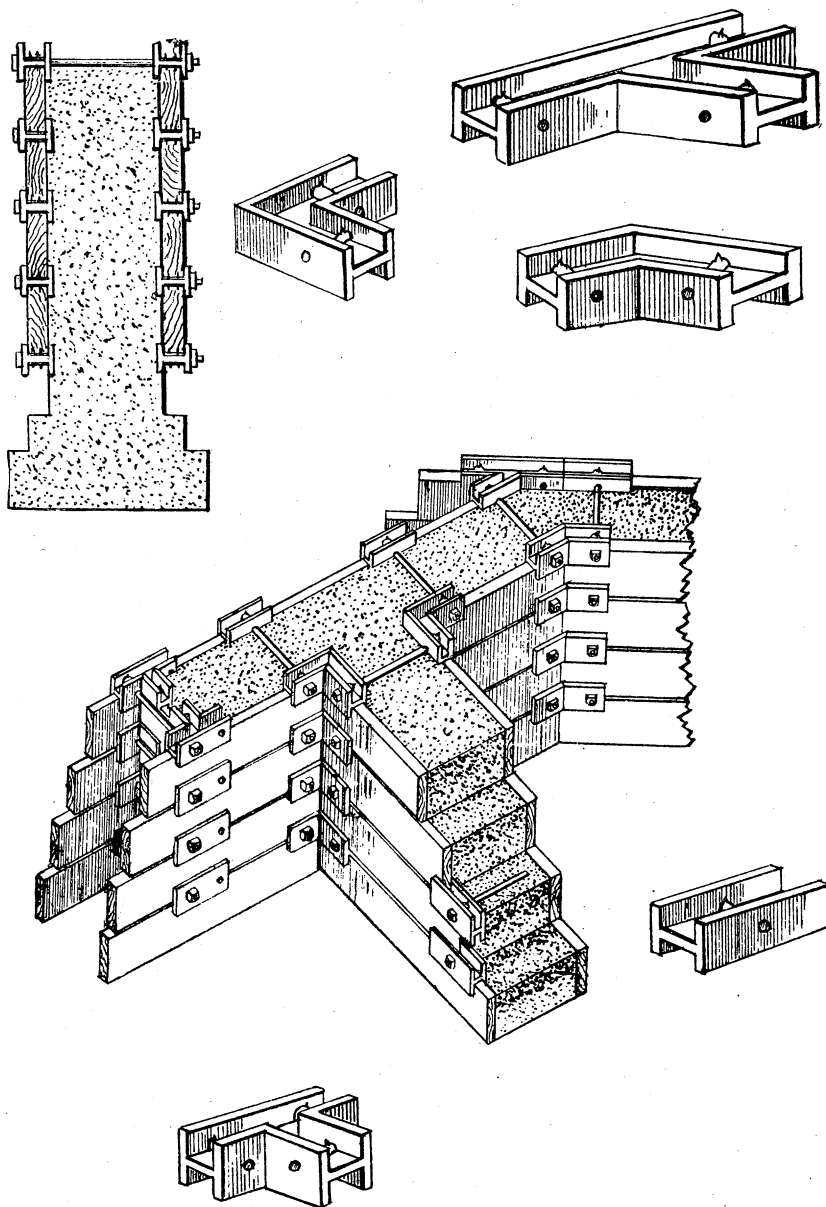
Farrell System of Molds for Concrete Wall Construction.
